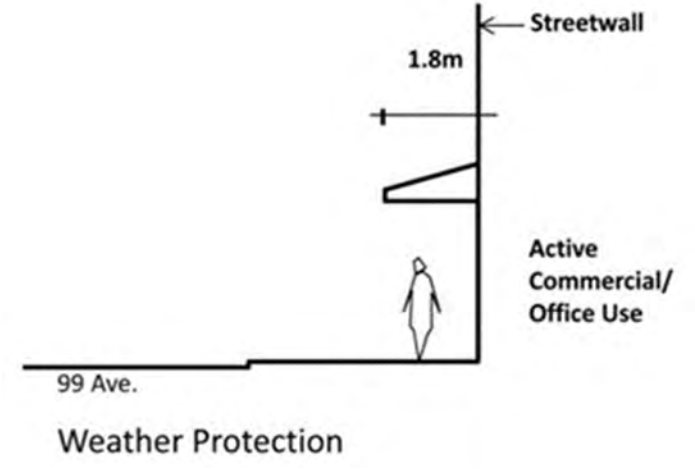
Core Commercial District - Downtown Ground Floor Frontage
